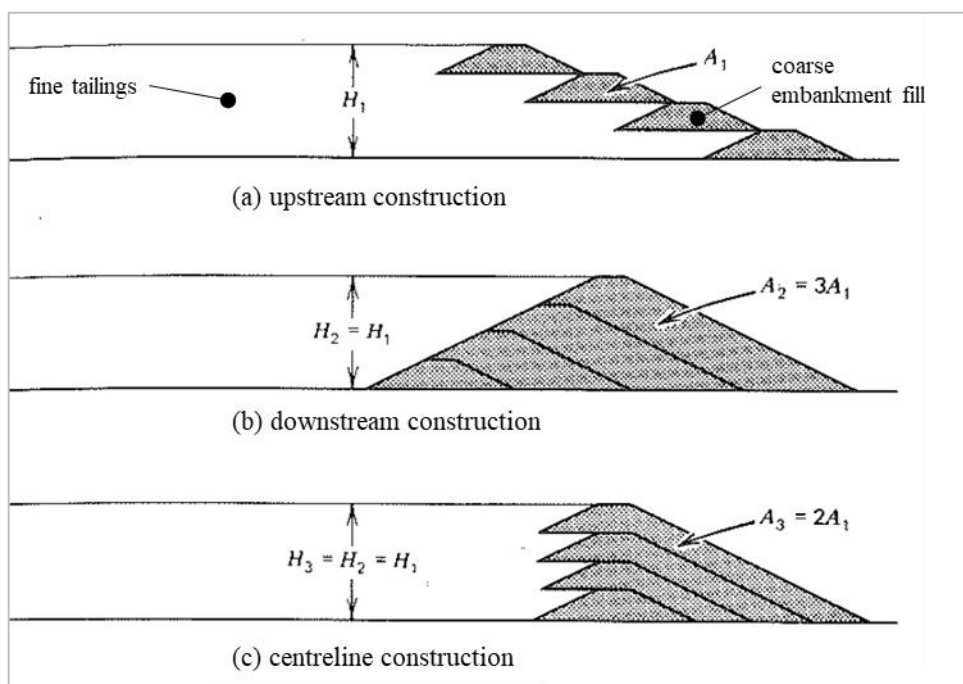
Typical tailings dam construction methods, after Vick (1983)
